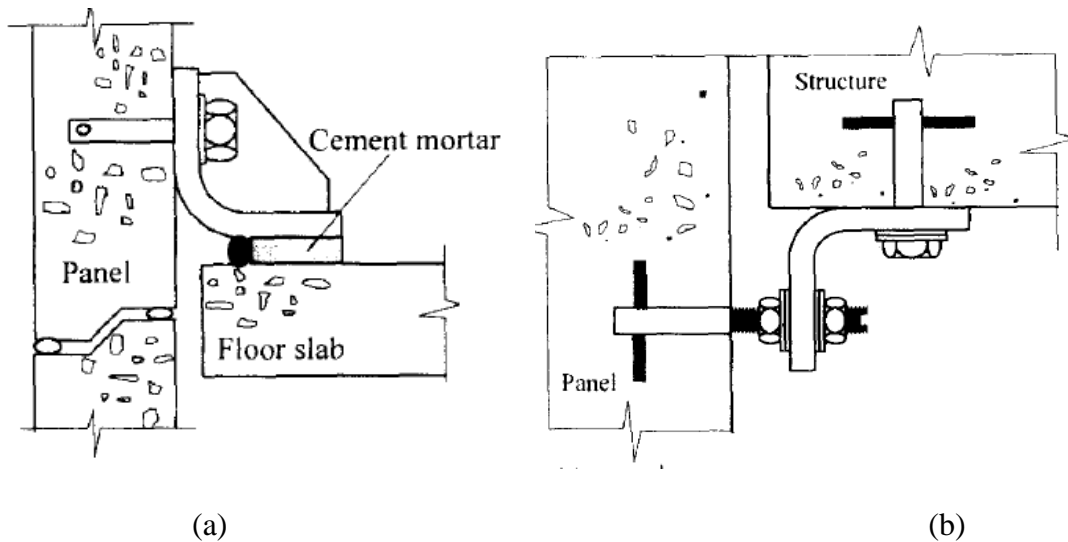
Typical connections for cladding panels: (a) typical load bearing connection, (b) typical restraint connection [83]
